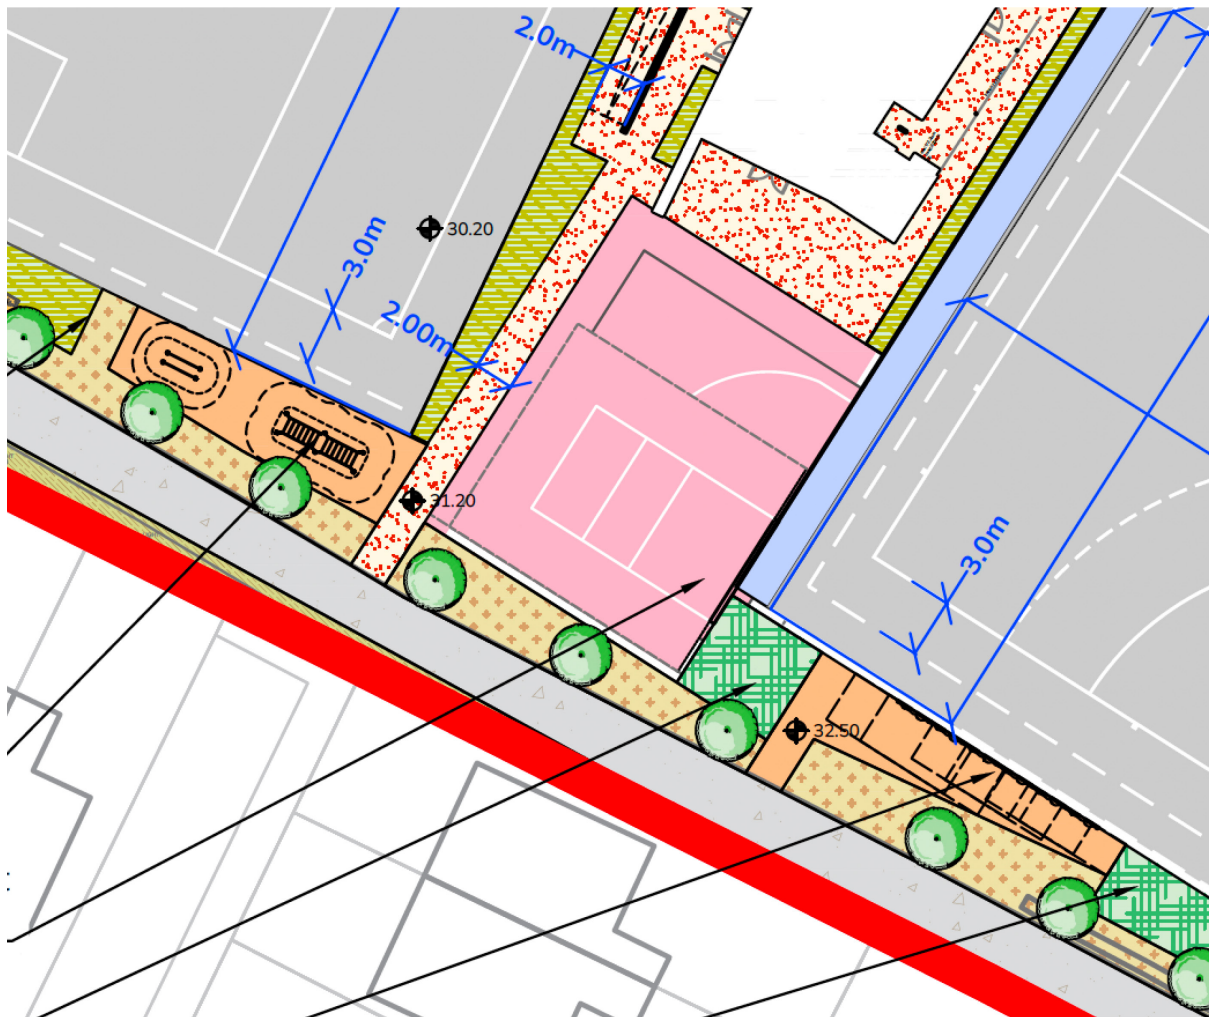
Sample of active recreation facilities, detail of proposed Site Layout Plan of Millers Lane (Drawing P612-MIL-LD-GA-101)
